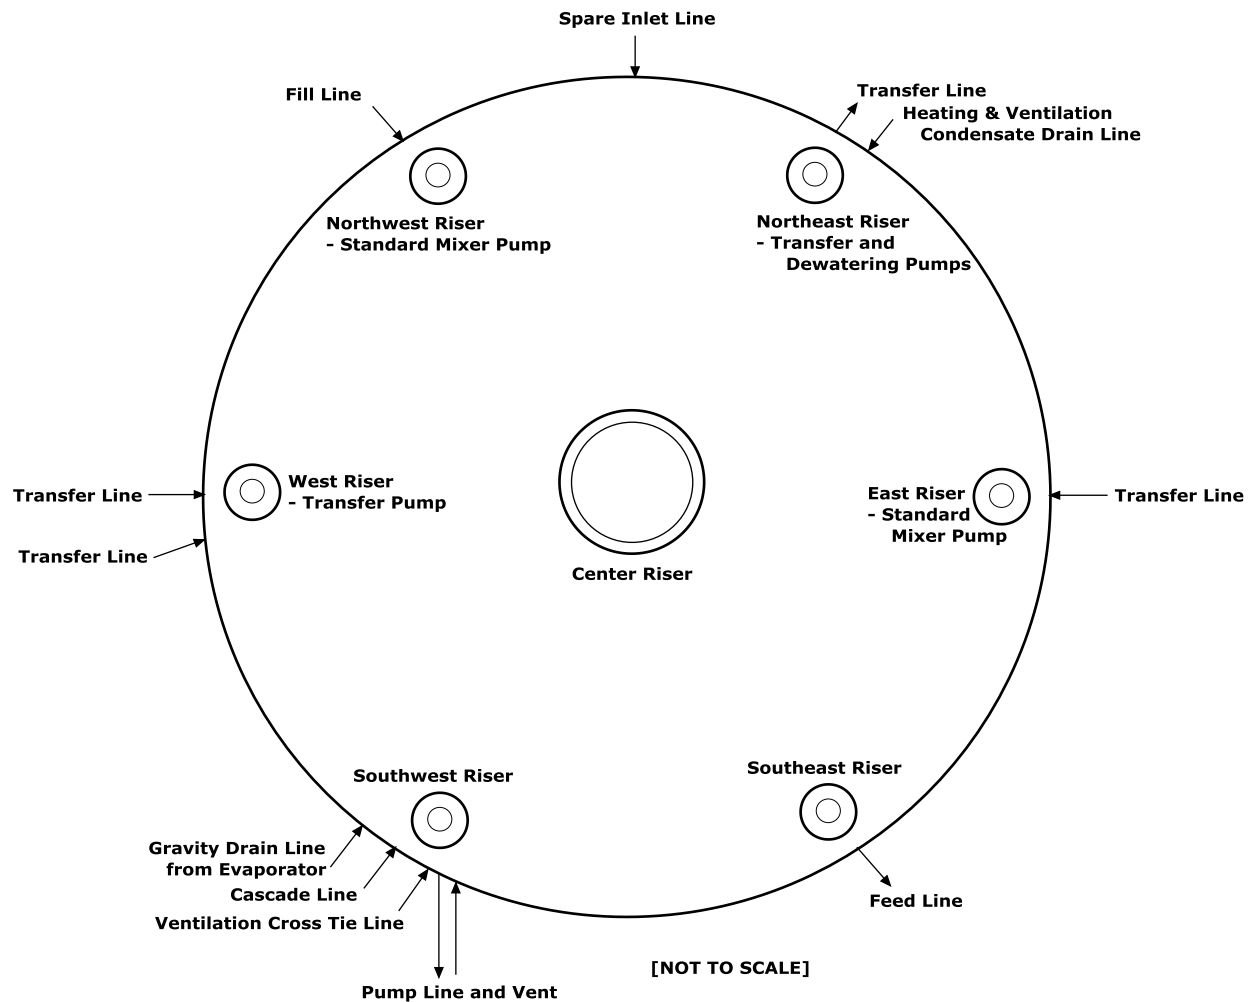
Typical FTF Type IV Tank Plan View
